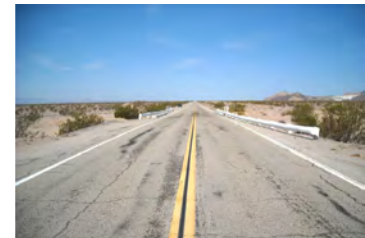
Existing 'C' shaped guardrail painted white (courtesy of San Bernardino County DPW)
